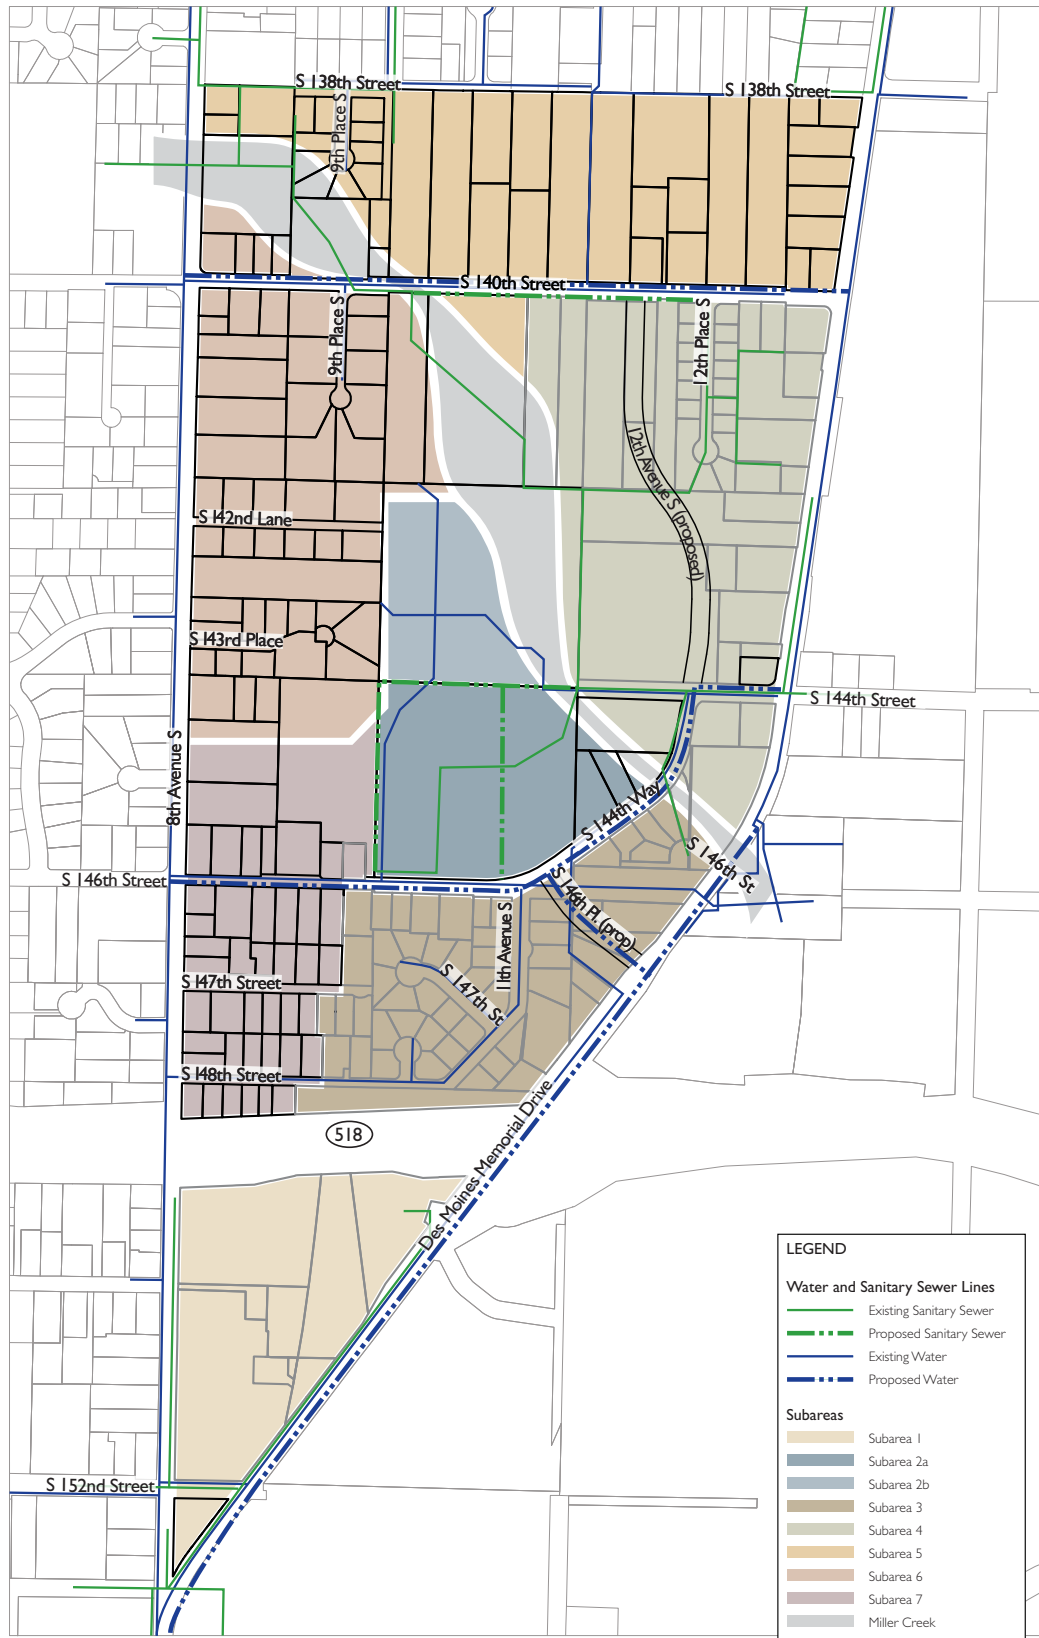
Proposed Water and Sanitary Sewer Improvements Plan
